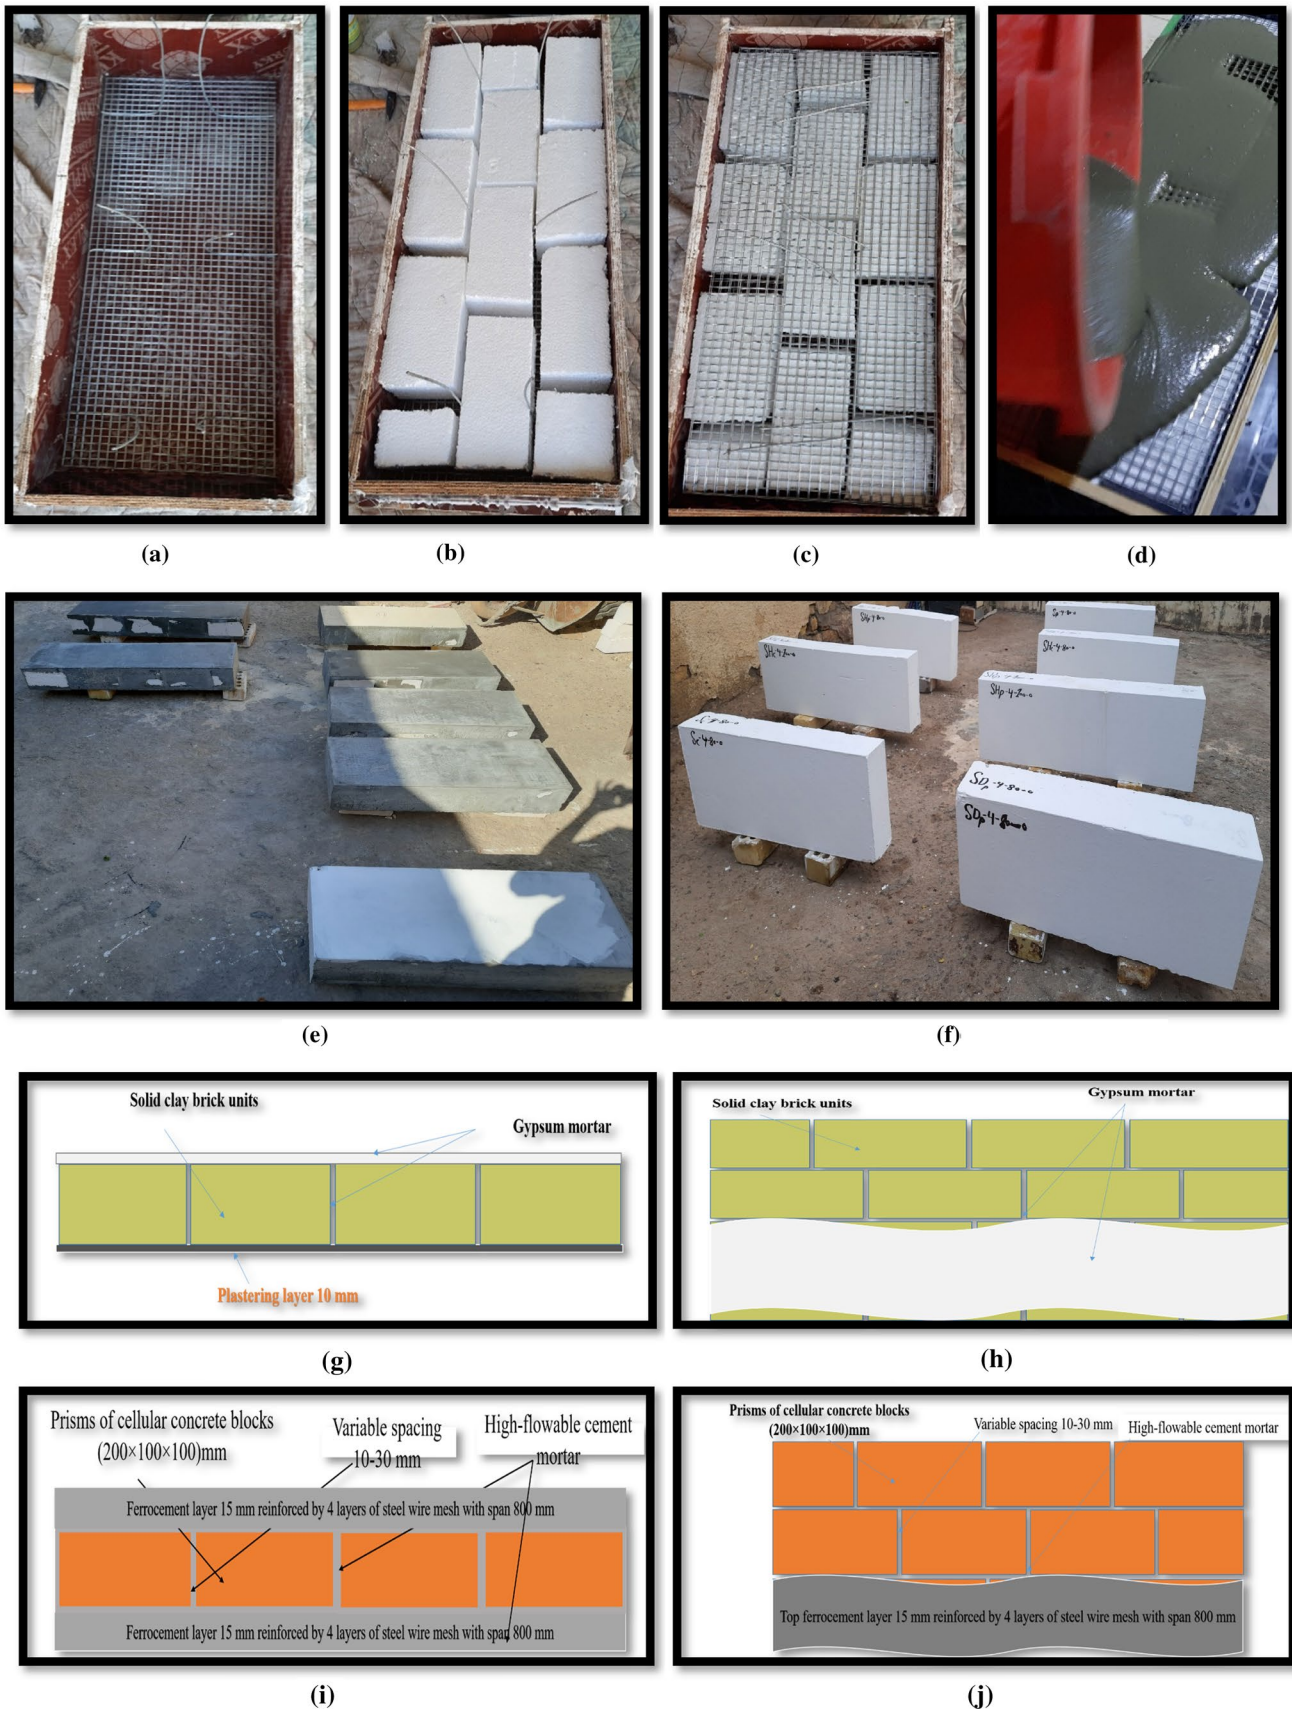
Steps for made specimen. a Prepare mold and reinforcement cage for bottom layer. b Layout units of styropor or cellular concrete block. c Apply reinforcement cage for top layer. d Apply cement mortar. e All specimens after open molds. f After painting all specimens and symbols
